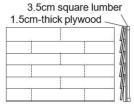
Slate Tiles Roofing. Slate tile: Kmew Colonial, Base material: lauan plywood, 12 mm-thick.
